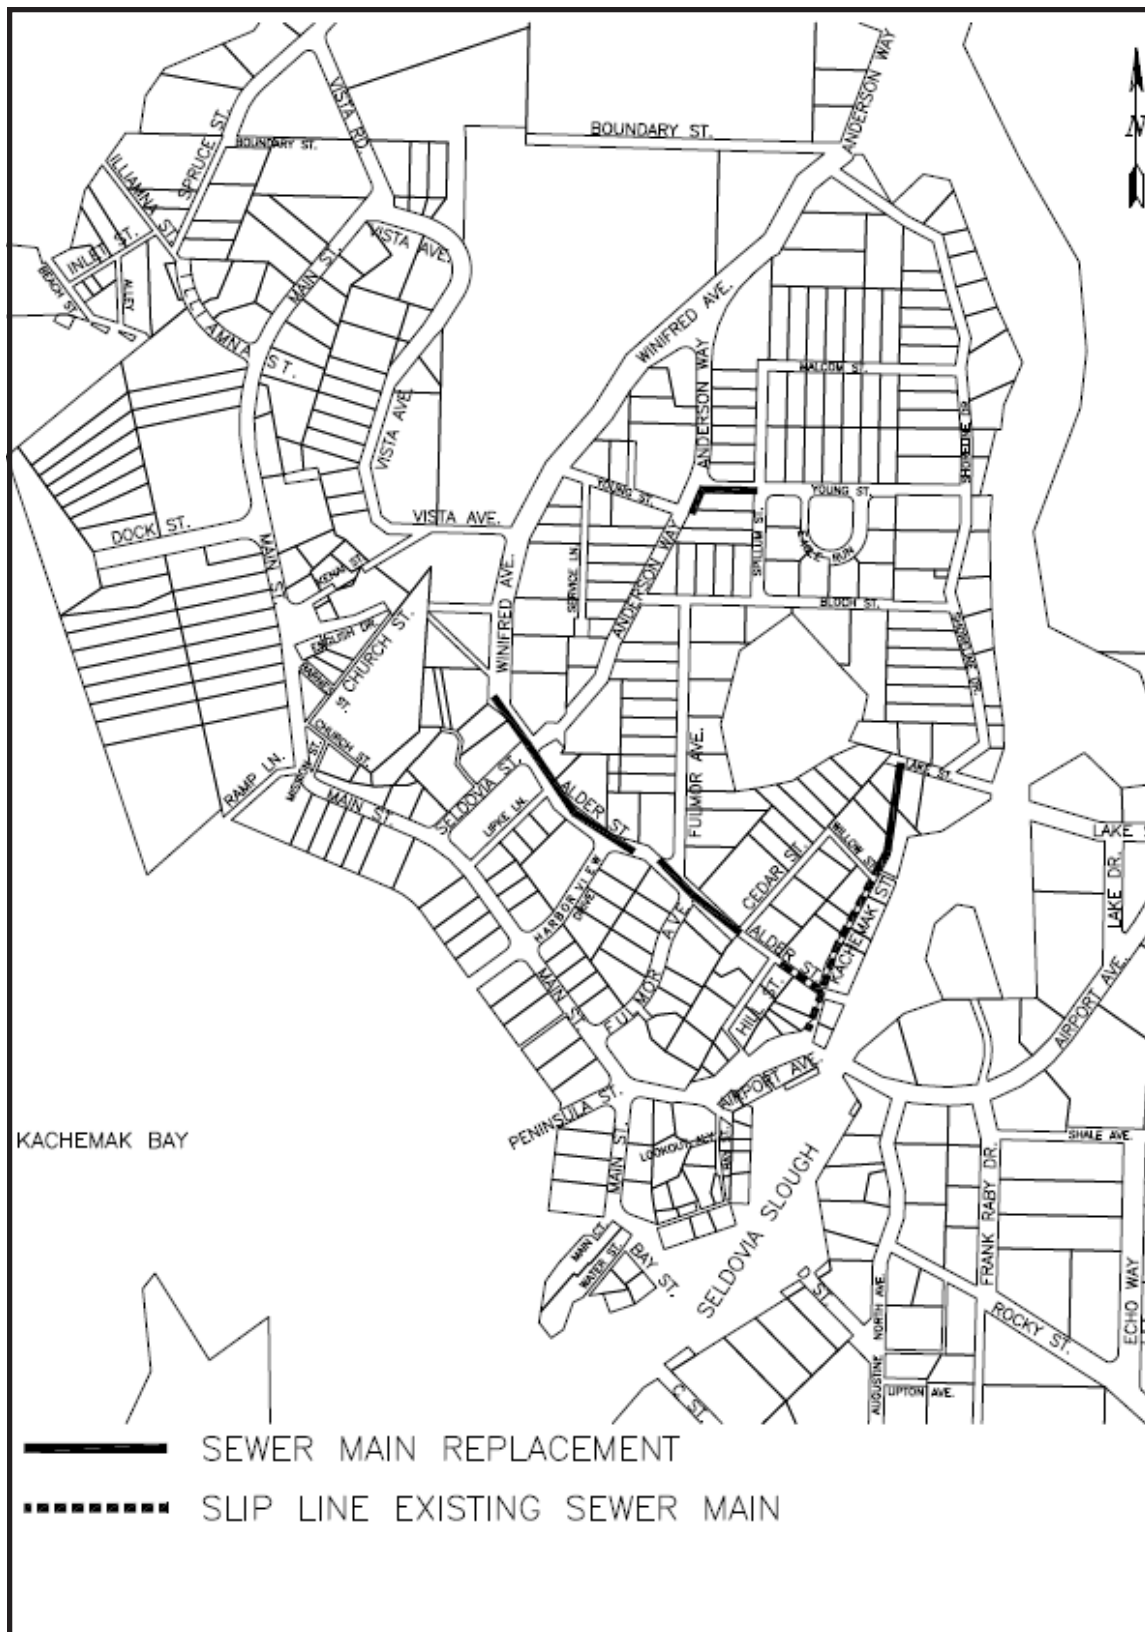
The plan prepared by CRW Engineering Group LLC shows sewer replacement along Alder Street and Kachemak Street, with a short segment along Young Street.
